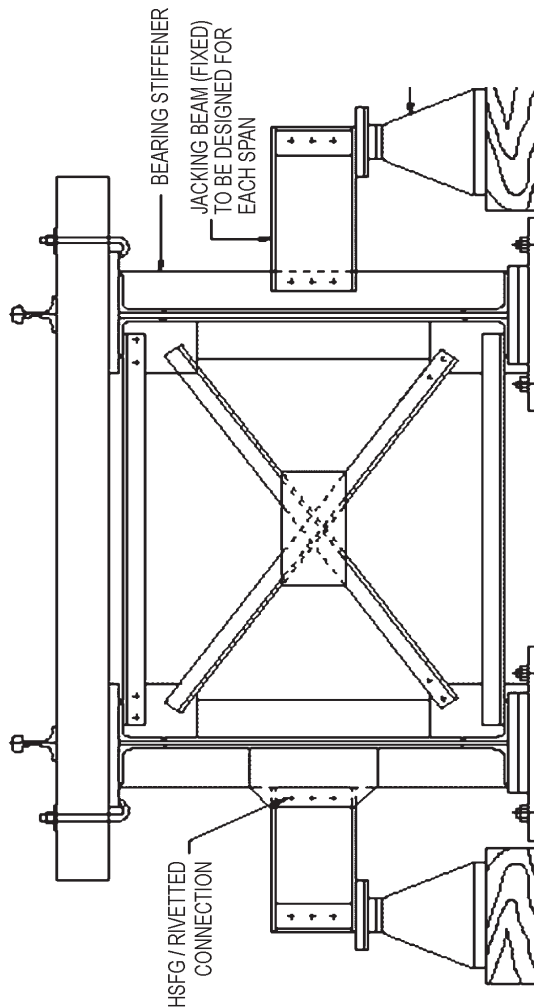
Proposed Jacking arrangement for 12.2m, 18.3m & 24.4m spans
